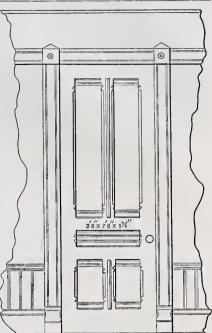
Elevation of Door in Dining-Room. —Scale, 3% Inch to the Foot.
